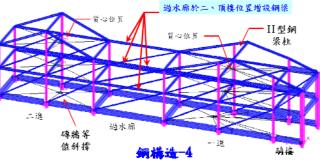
type 4-adding steel frame with 2nd story girder at Fig.9 type 5-adding 2 steel column at middle open space middle open space
